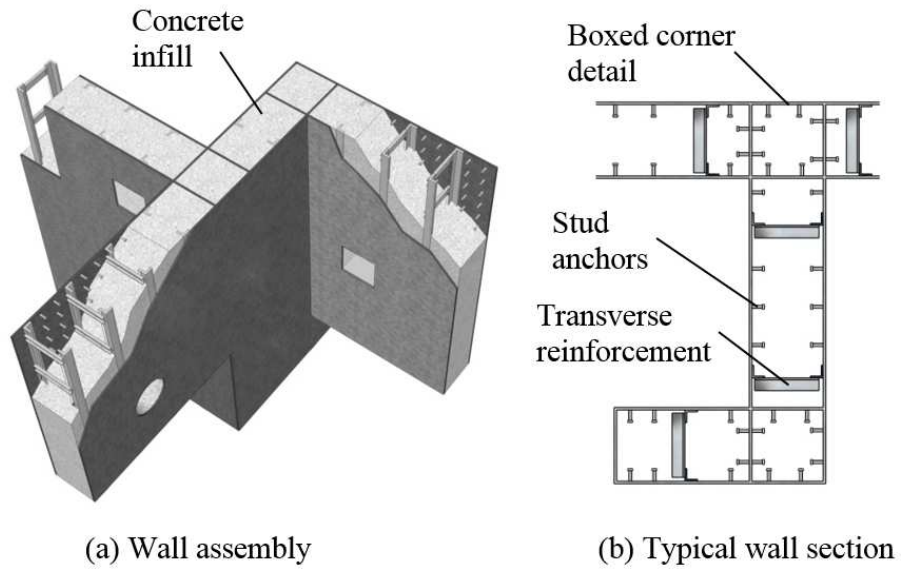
(a) Typical SC wall details, and (b) cross-section of SC wall (right)
